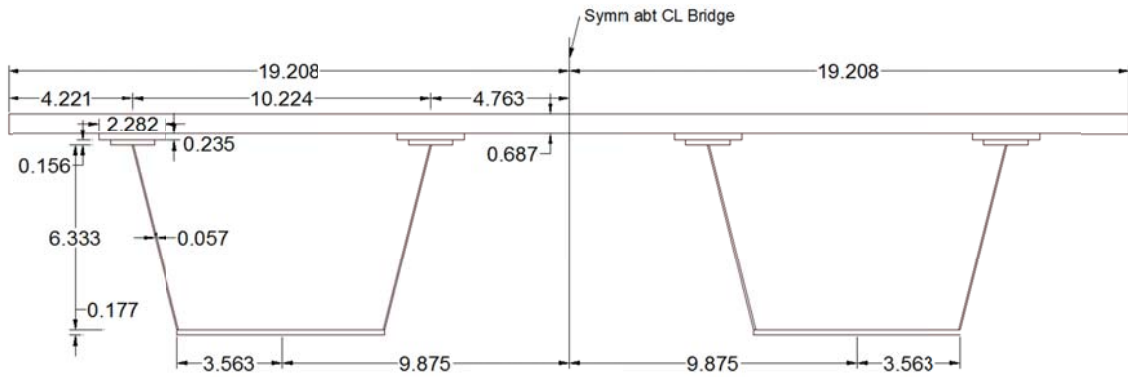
Typical steel BOX cross section (1) for L = 240ft
